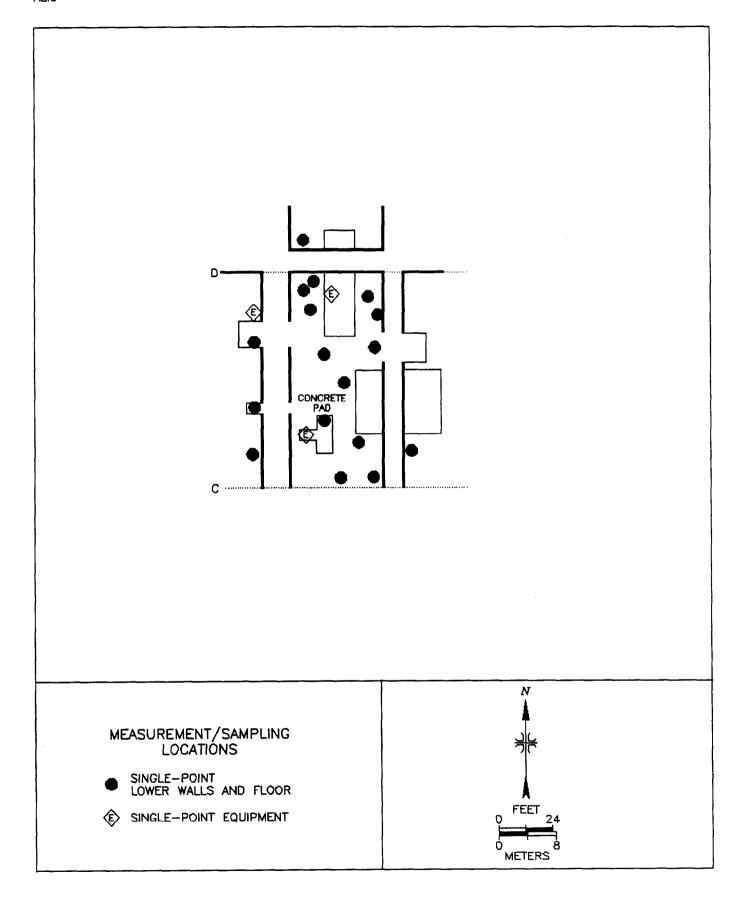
Building 1, Section D — Measurement and Sampling Locations
